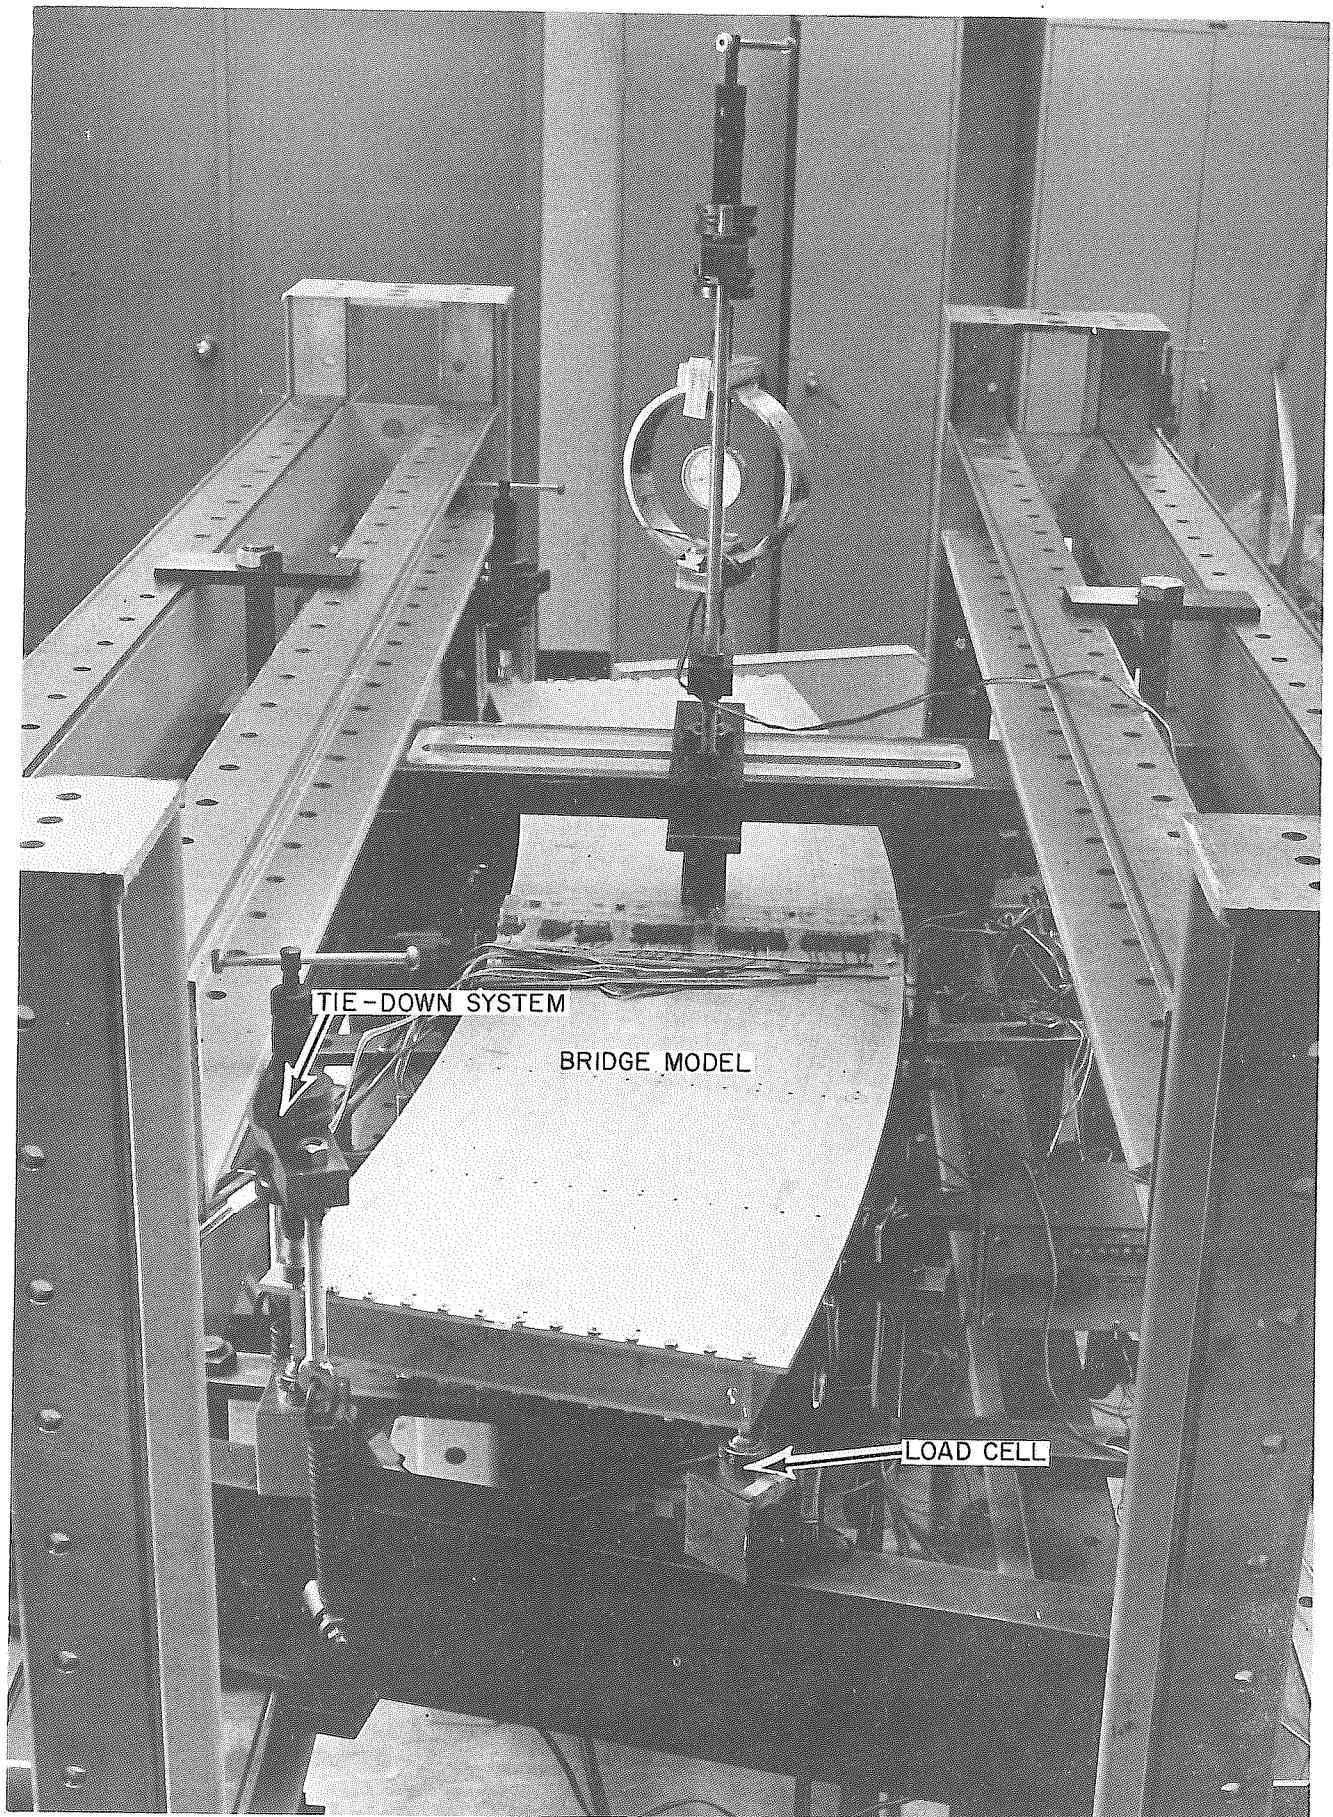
A TYPICAL CURVED BOX-GIRDER BRIDGE MODEL UNDER TEST
